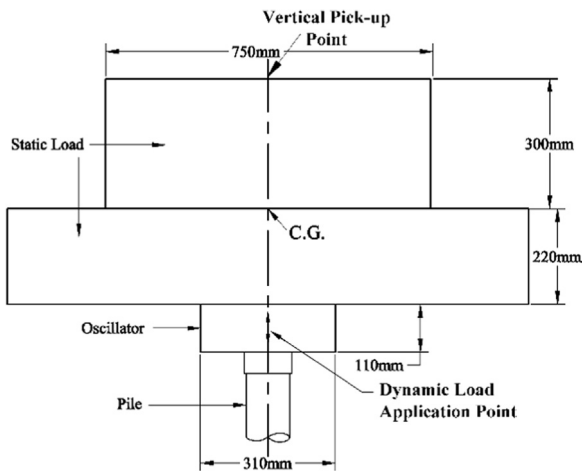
Detailing of pile cap and point of vibration pick-up.
